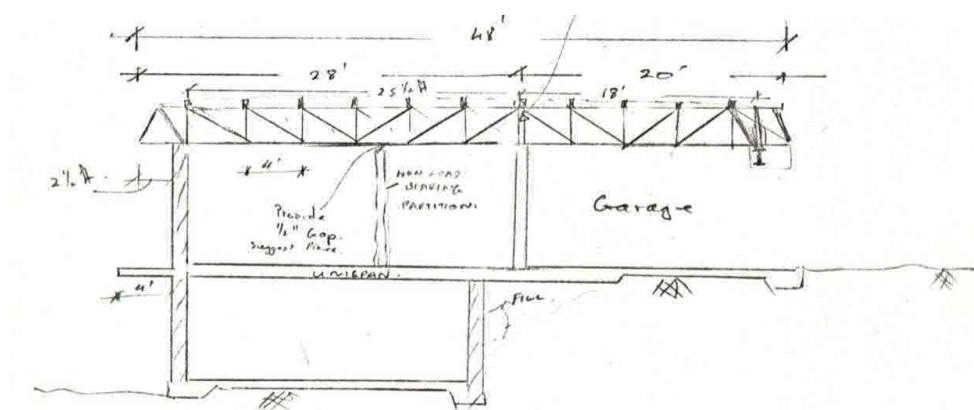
Main dwelling form from 1975 structural design calculations. The section is a SW-NE direction.
